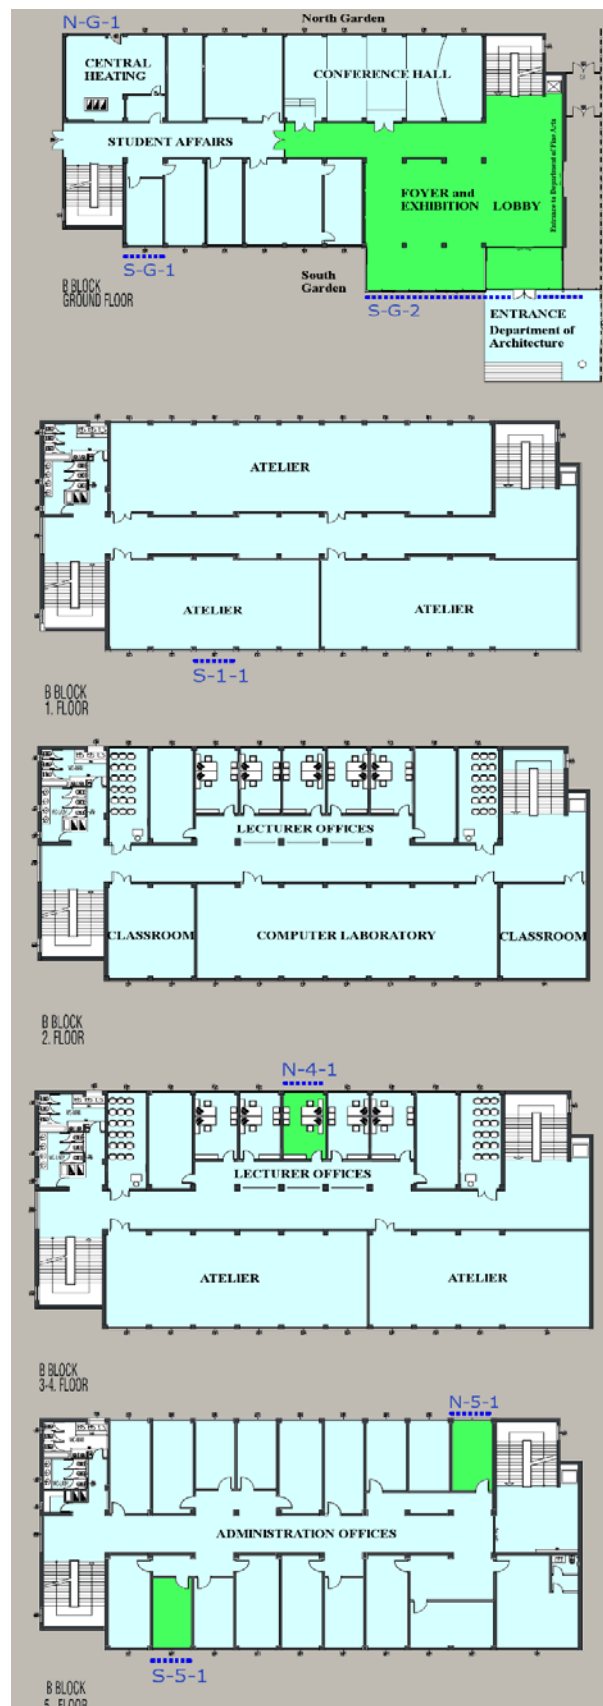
Plans of Faculty of Architecture and Design building in Antipark Campus (taller one), [14]
